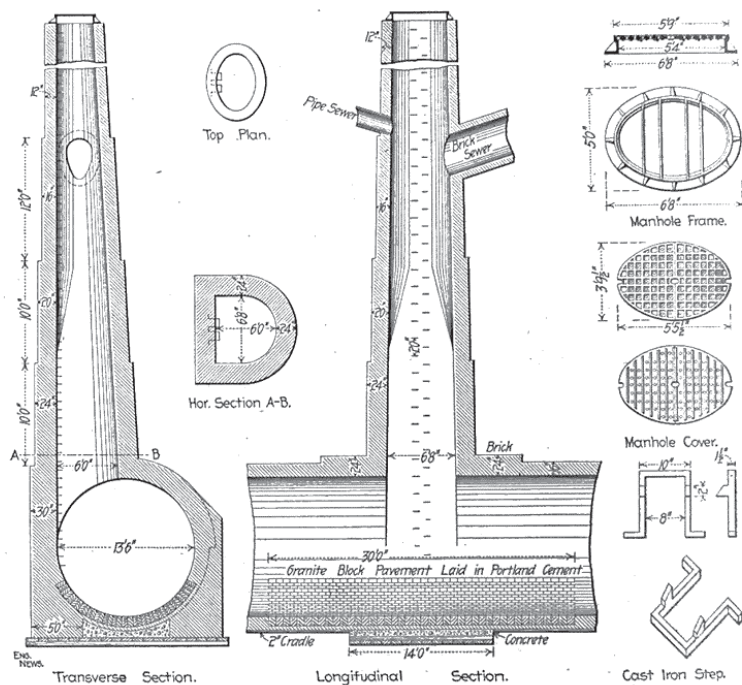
DEEP MANHOLE CONSTRUCTION ON 60TH ST. SEWER TUNNEL, BROOKLYN, N. Y.
